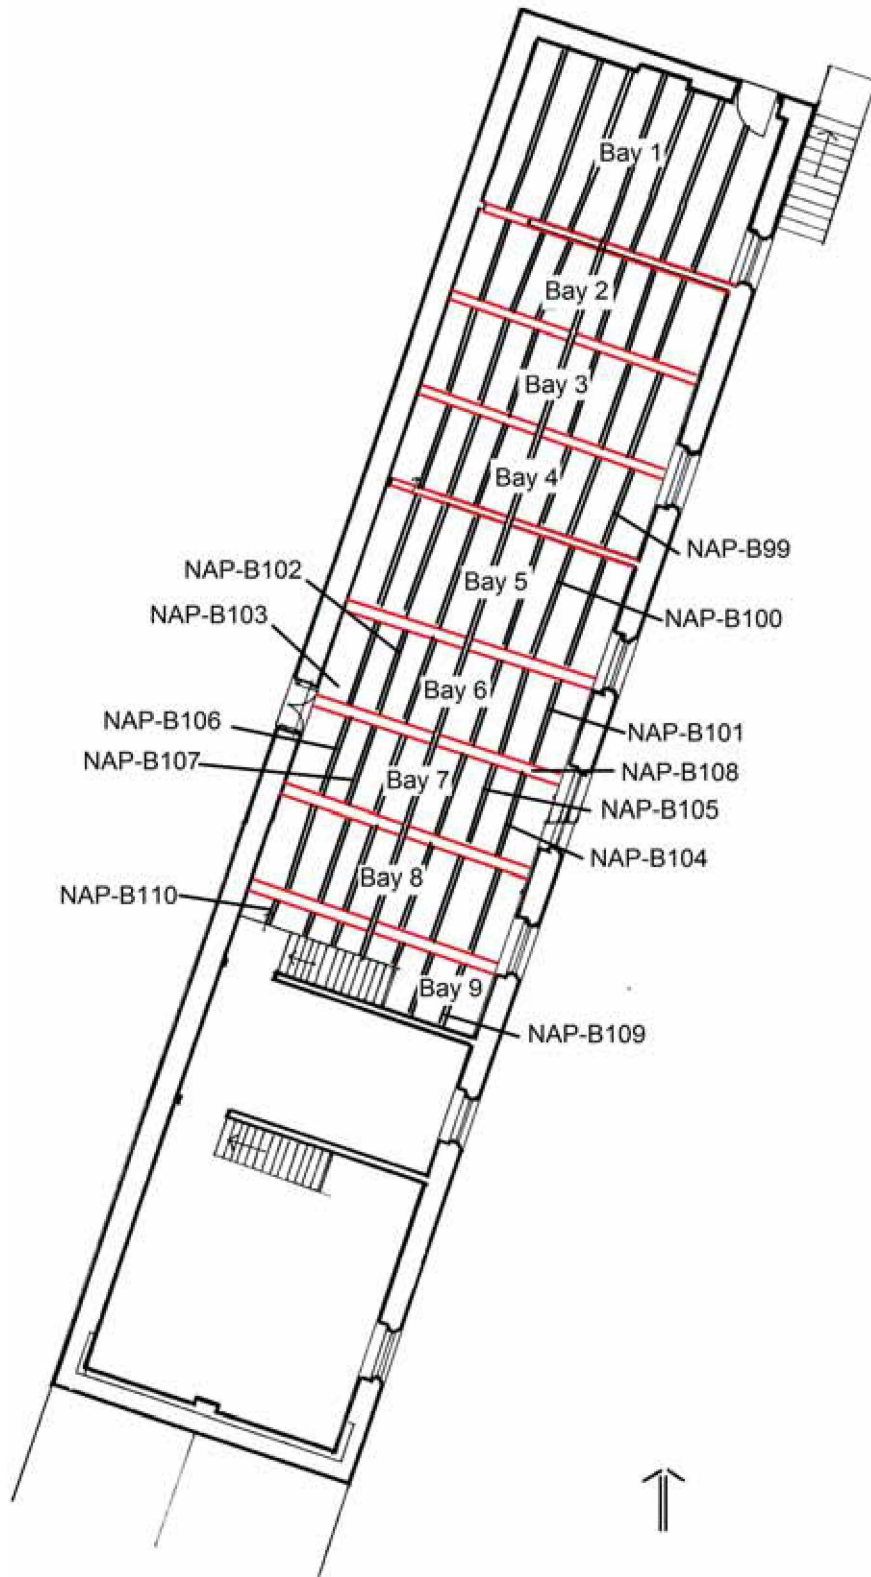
Stables/Coach-house range, first-floor plan showing the location of samples NAP-B99-110 (John Warren)
